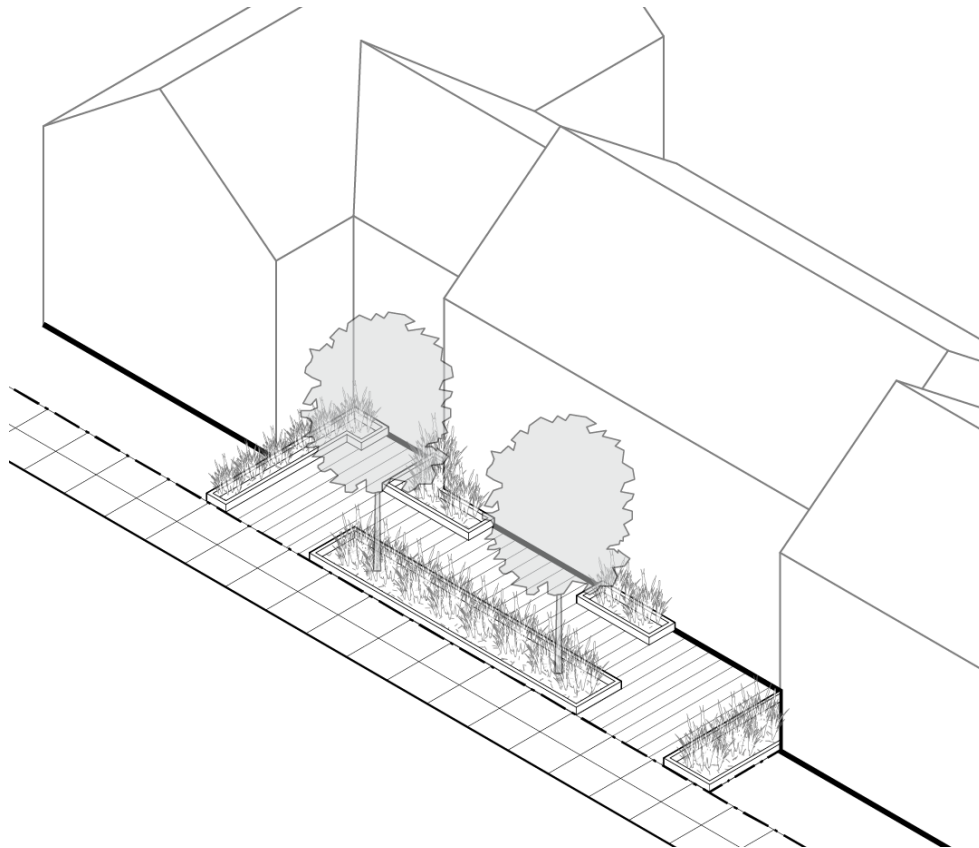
Example of a planting zone to add variety and depth to a large building facade
